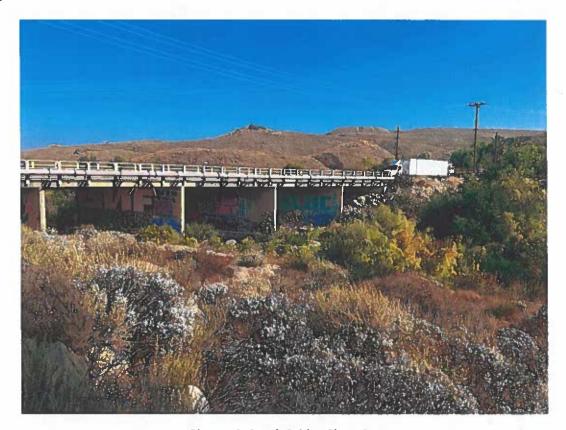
Concrete Bridge Deck with Methacrylate Deck Treatment
